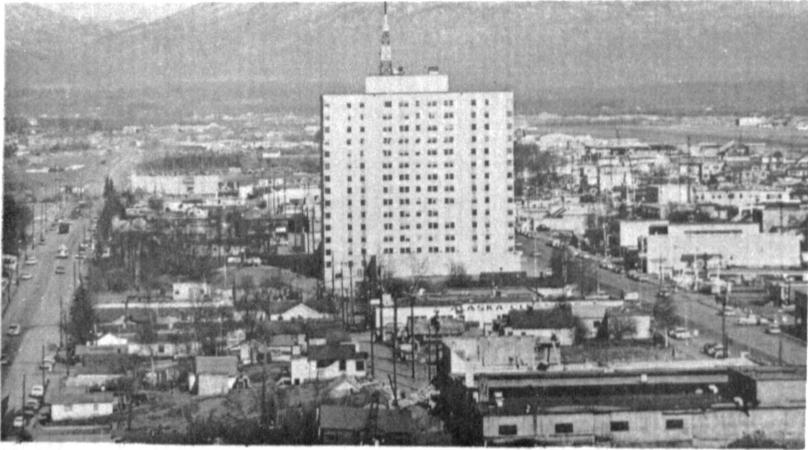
Mt. McKinley Apartment Building. Structurally almost identical damage to 1200 "L" Apartment Building (Fig. 13).
